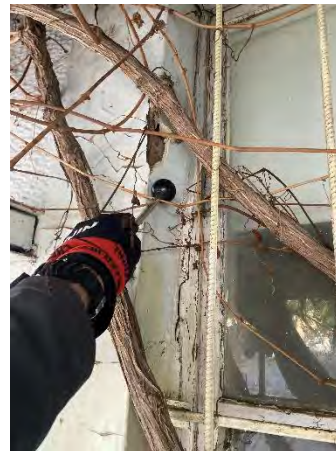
Repairs to brick work, salt damp, quoin work required to front facade.
